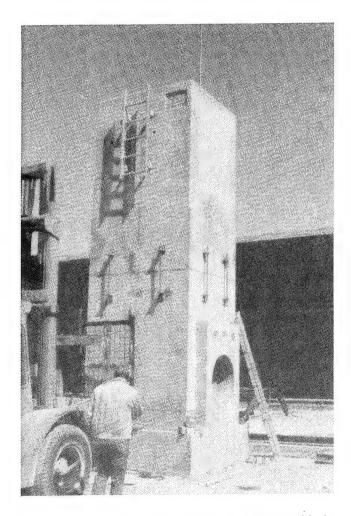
Two-section gatewell, preassembled at precast yard, Chouteau Island Levee (from Atchley 1989)
